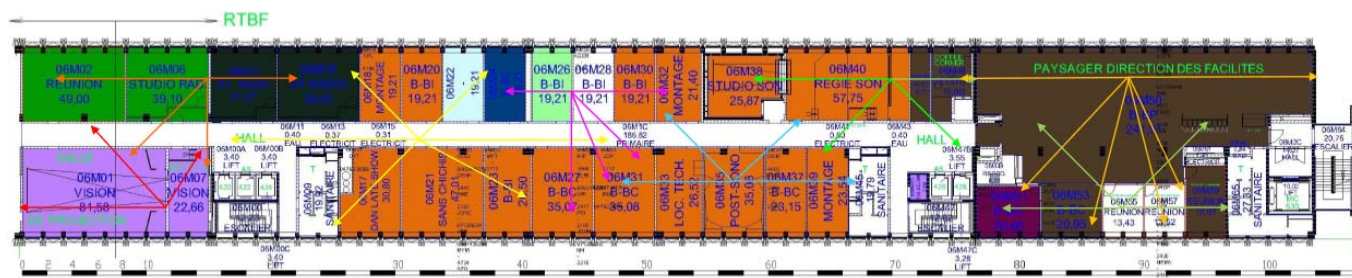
Design at 5 GHz for Floor 6 in Building CHJM
